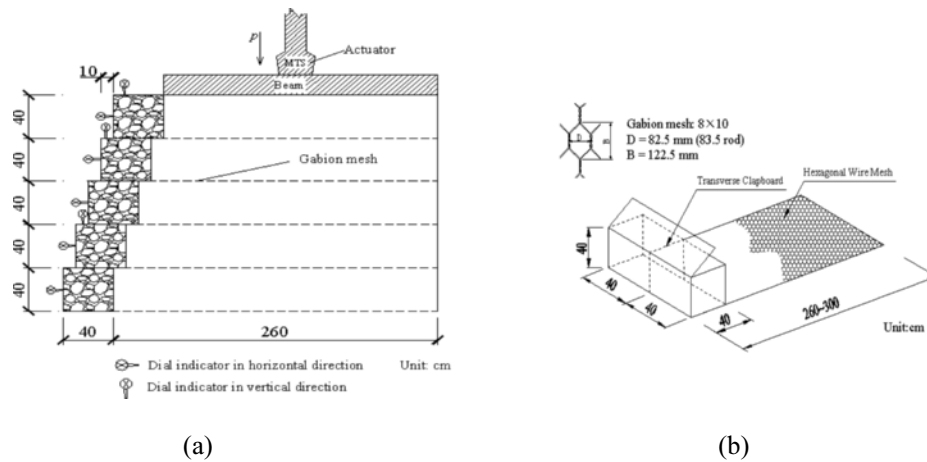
(a) Reinforced gabion retaining wall; (b) Reinforced gabion component
